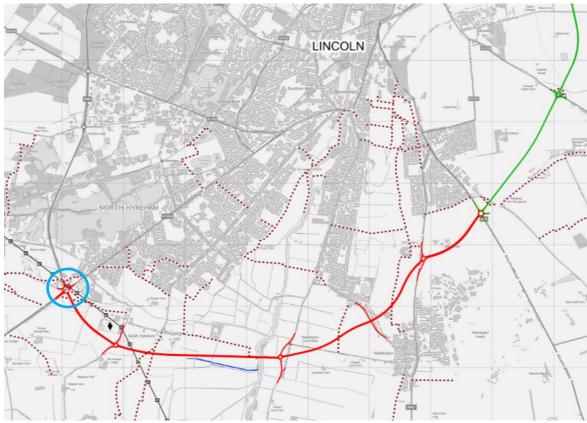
Location Plan, NHRR (Red), LEB (Green)
